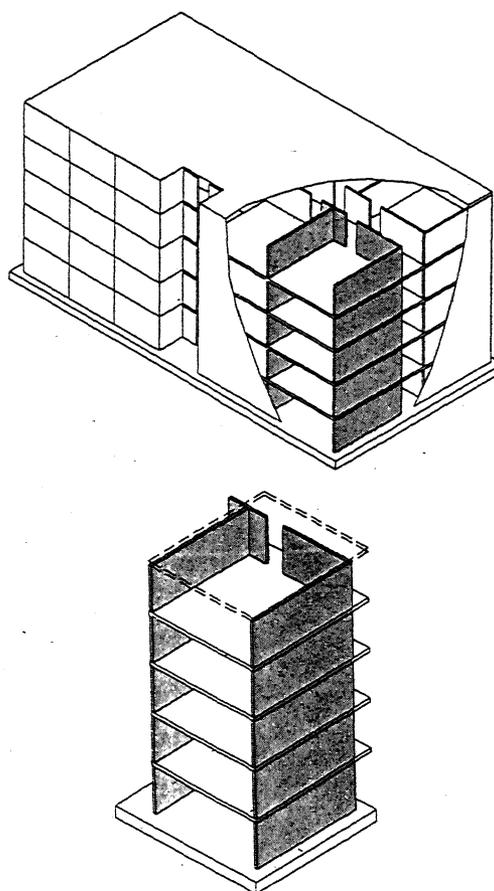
Five-story full-scale masonry research building: prototype structure and test specimen.
